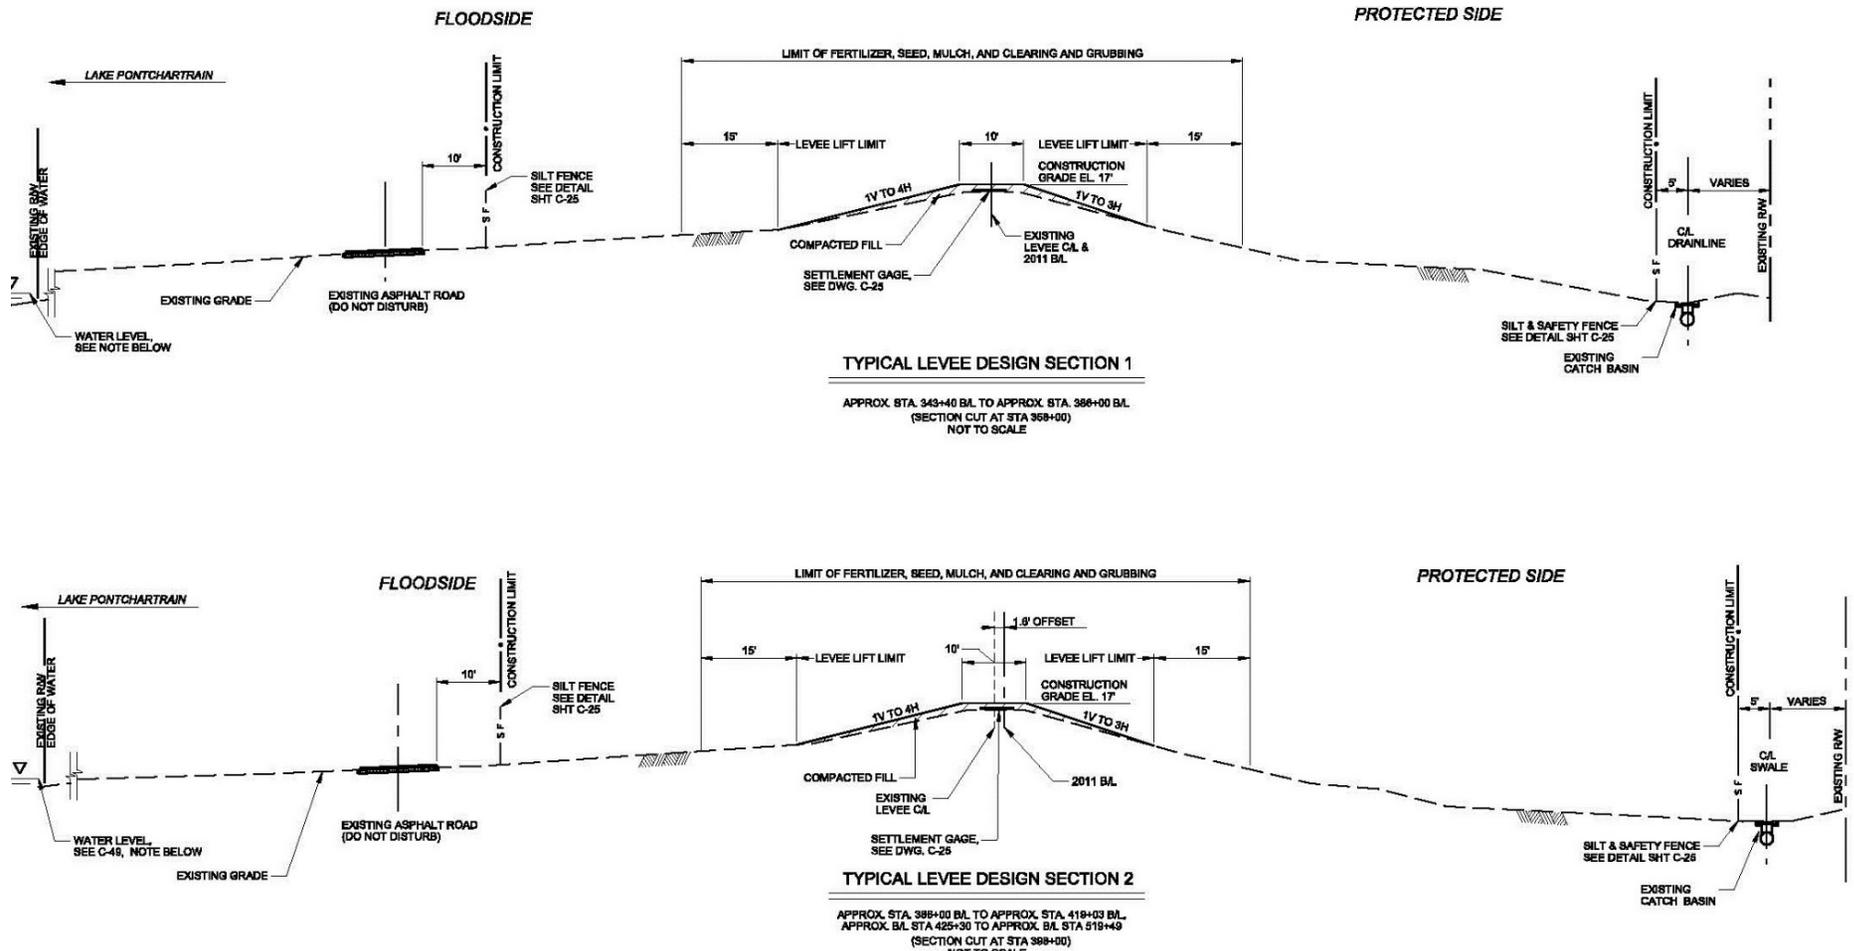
Typical Levee Cross Section, LPV 19.2 and 20.1
